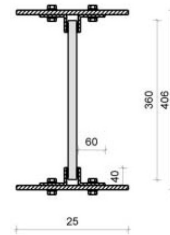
Glass-steel beams (section), by Wellershof & Sedlacek.
